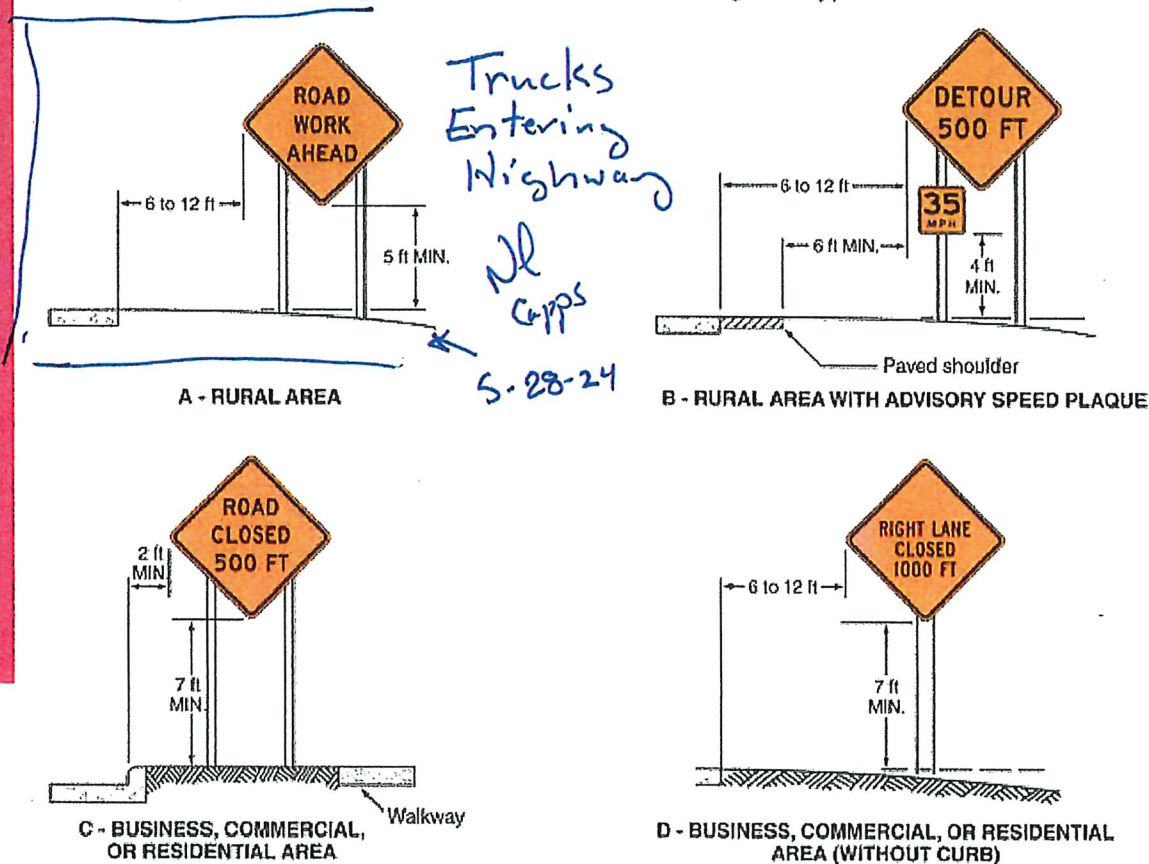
F-1. Height and Lateral Location of Signs—Typical Installations
